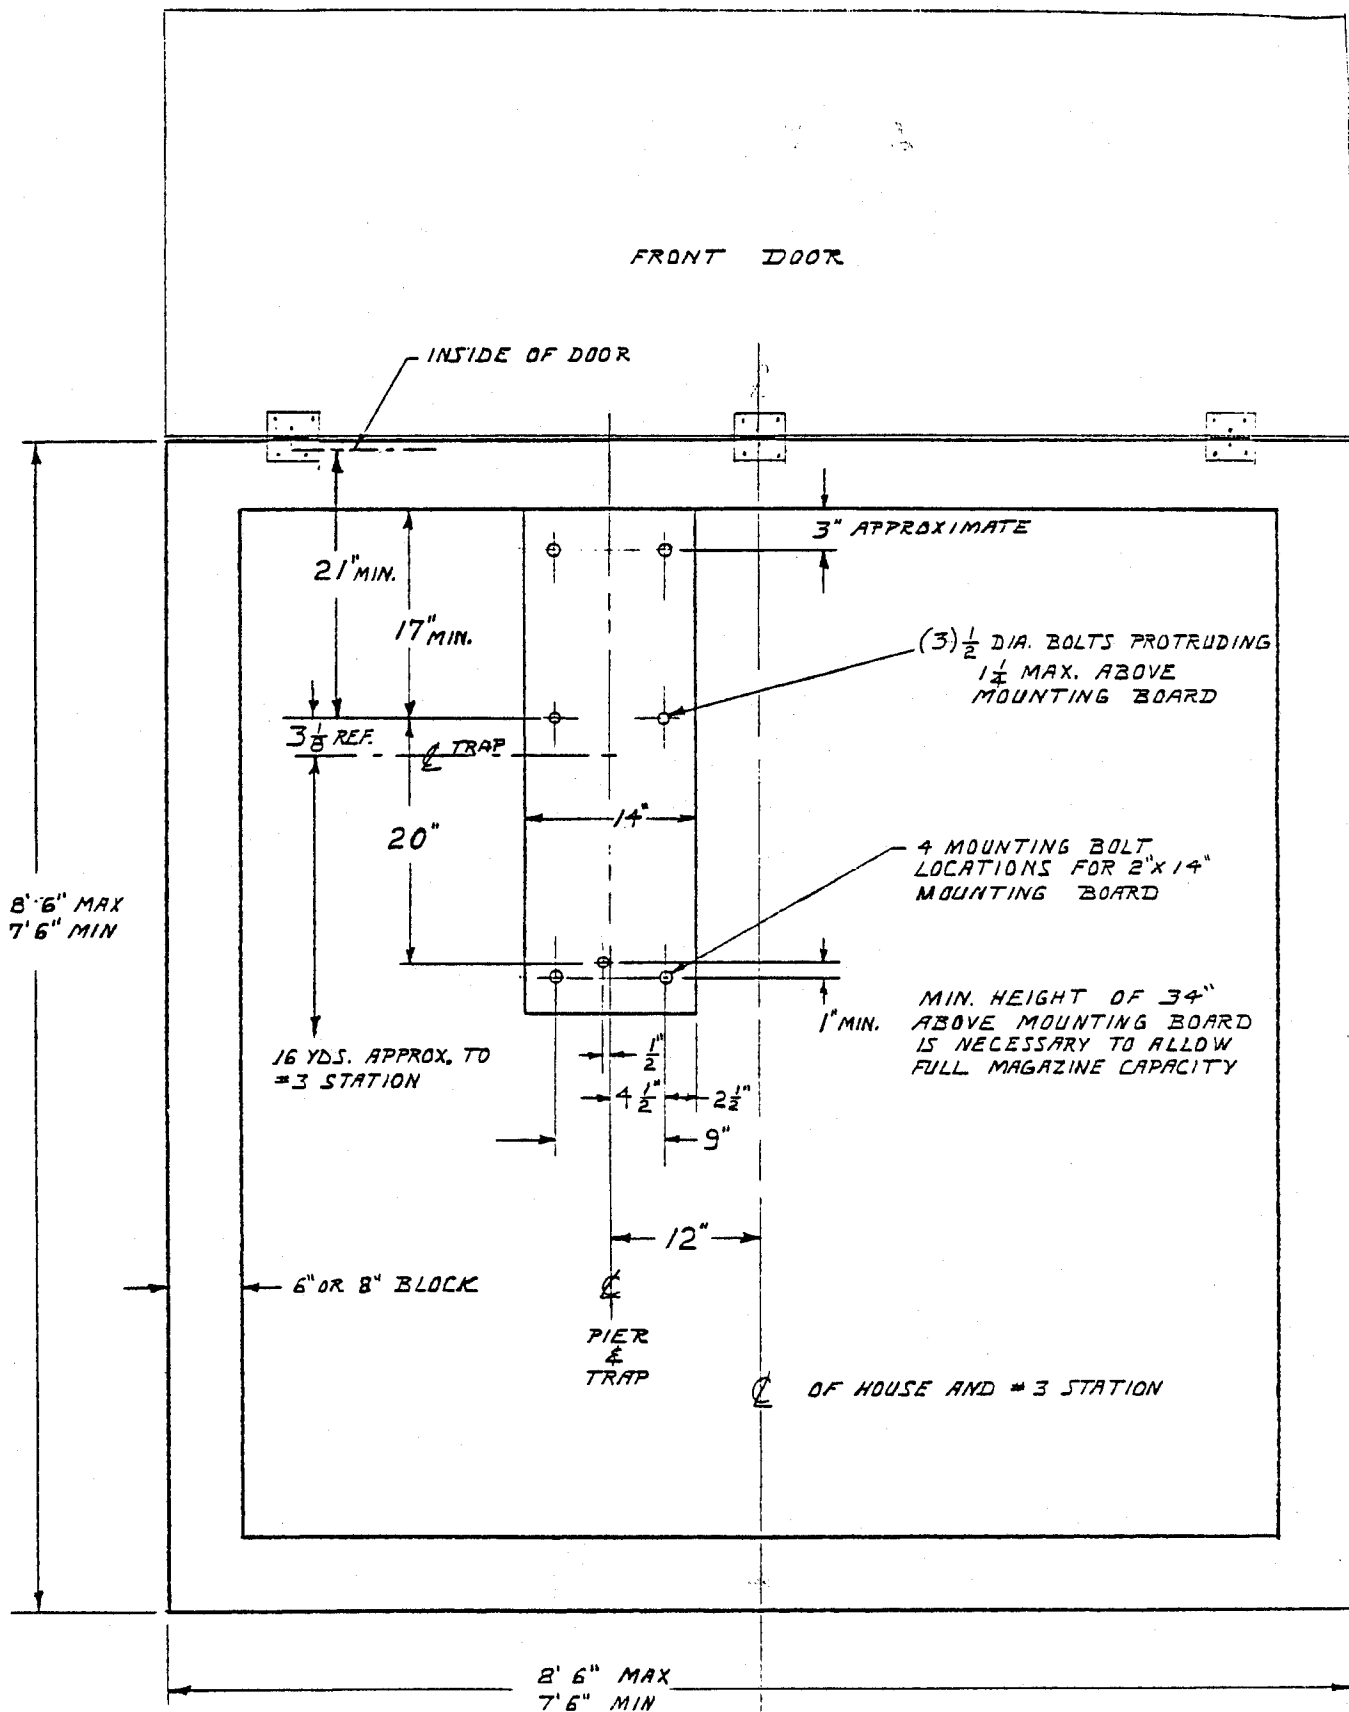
4100 TRAP MOUNTING LAYOUT
